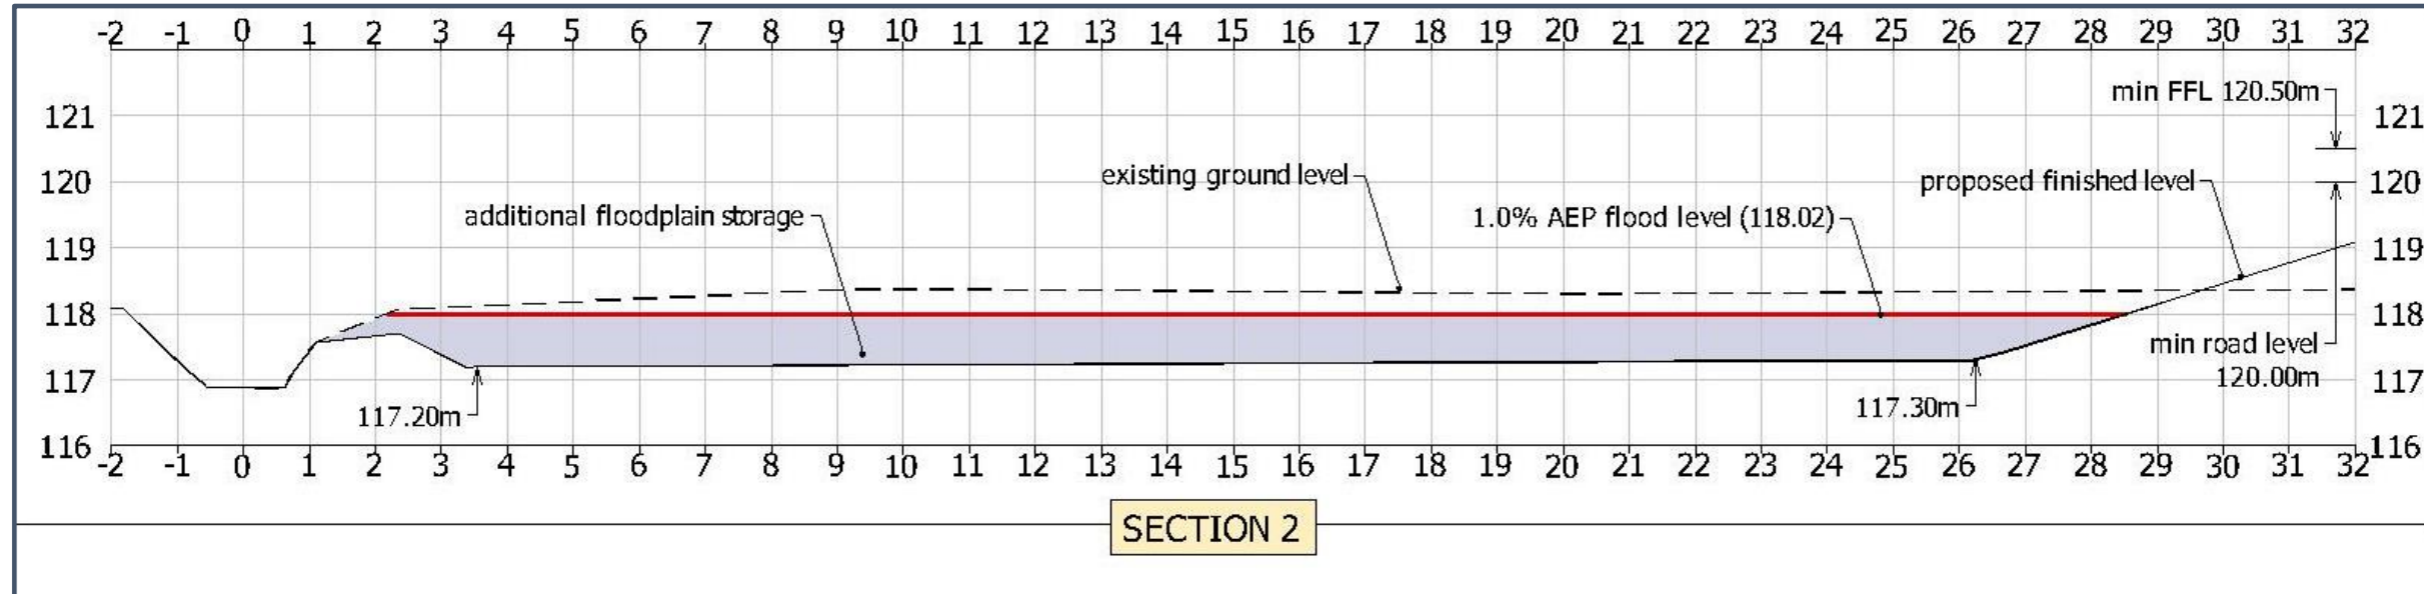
Plan and Typical Sections for Compensatory Storage Basin (continued)
